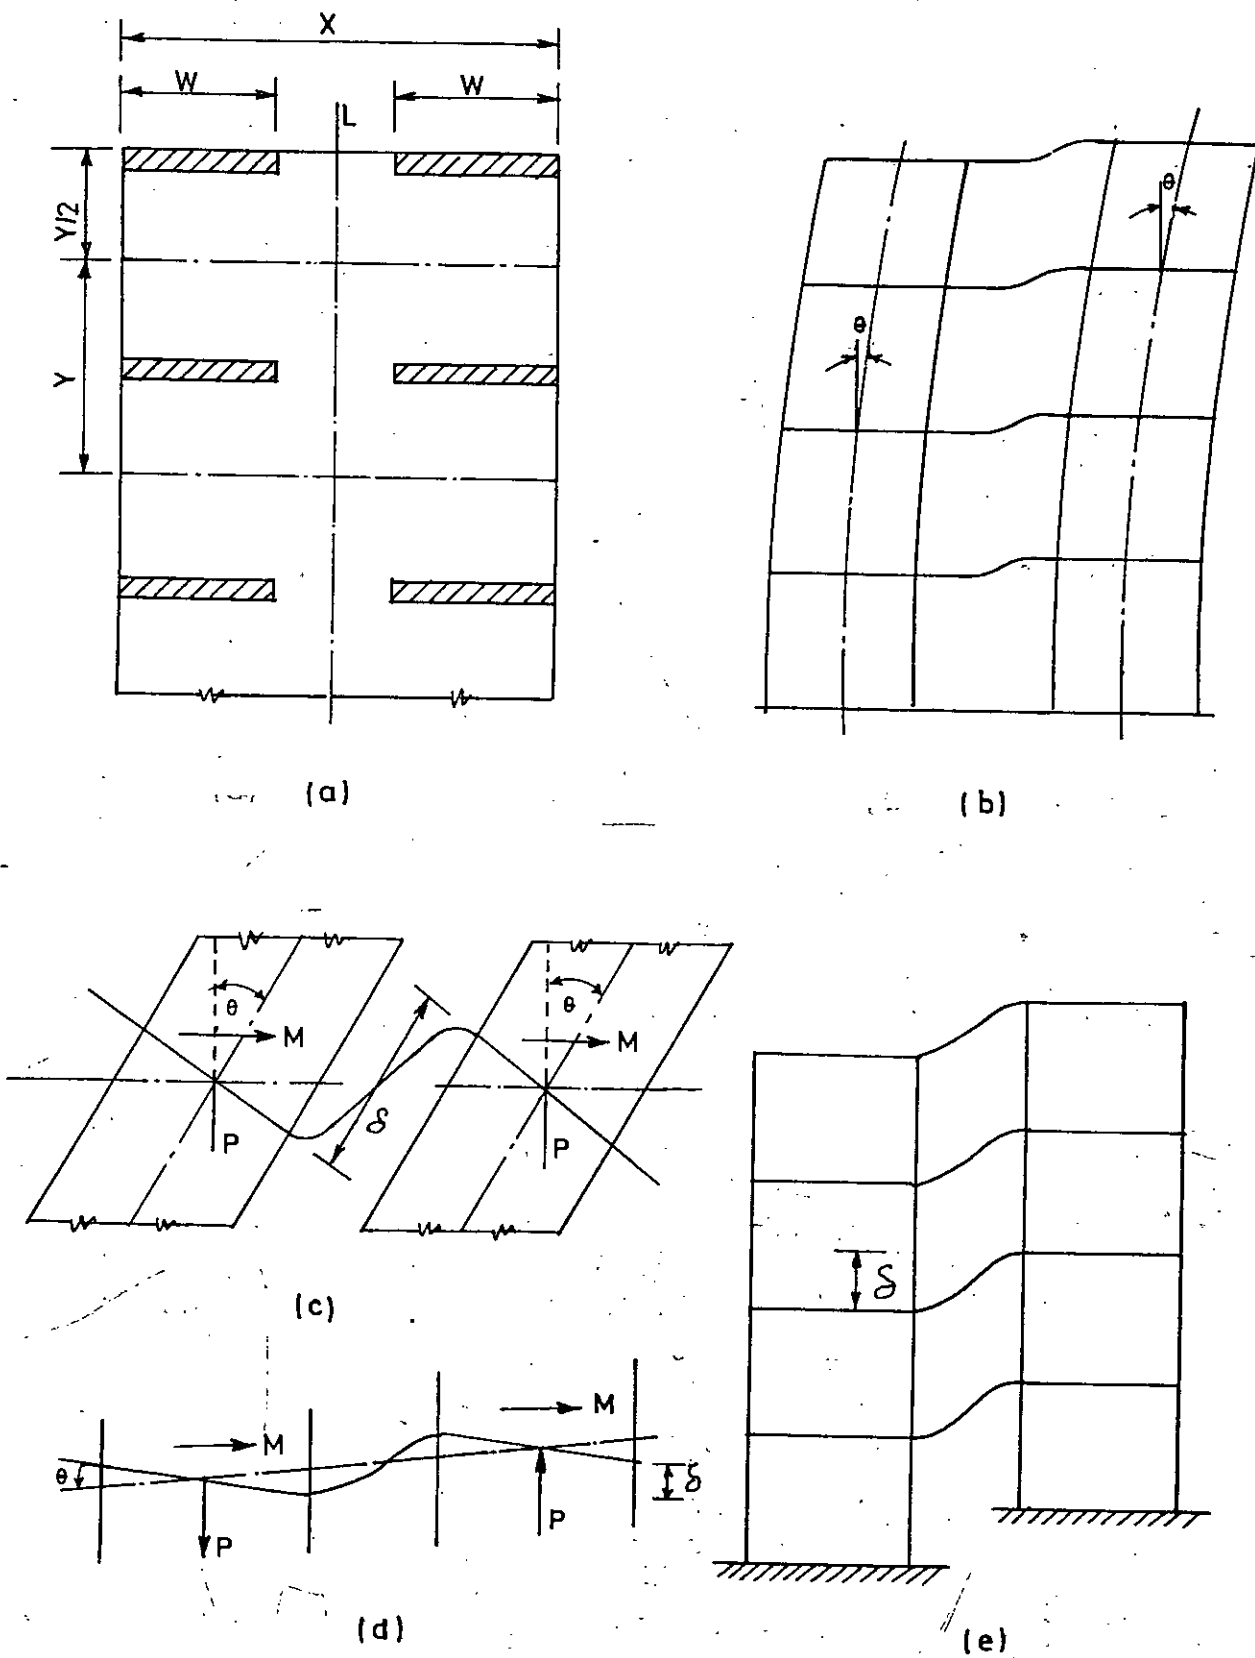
Structural action of coupled shear wall-slab structure.
